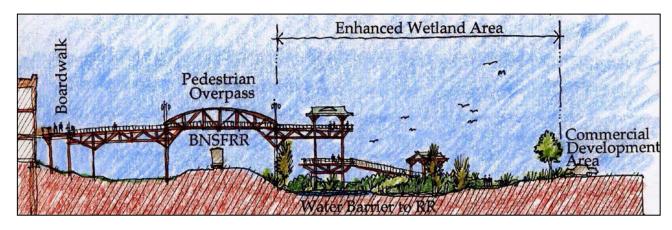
Conceptual cross section, looking southerly from Marine Drive, toward Planning Area 2: Plover Park
